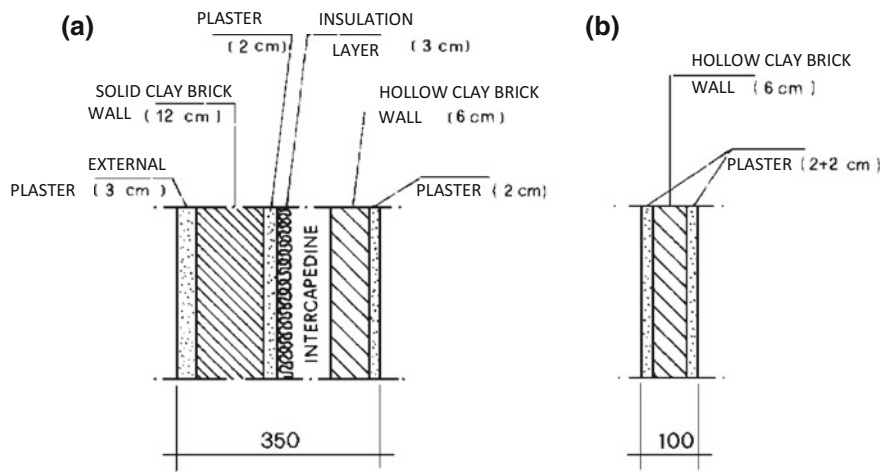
Details of cladding (a) and partitioning (b) walls
